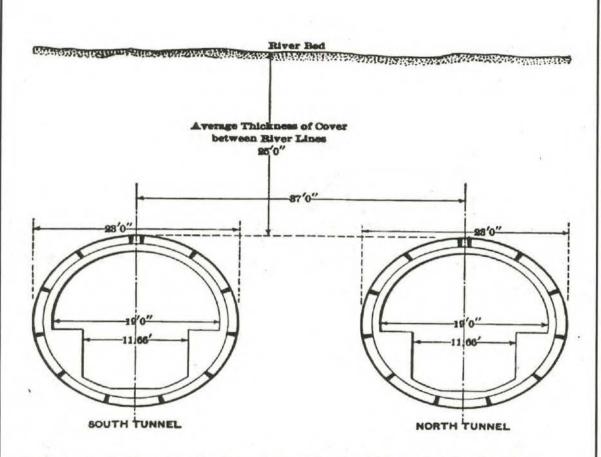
North River Tunnels - Typical Cross-Section Showing Relative Positions of Tunnels (The Subways and Tunnels of New York: Methods and Costs, p. 47.)
